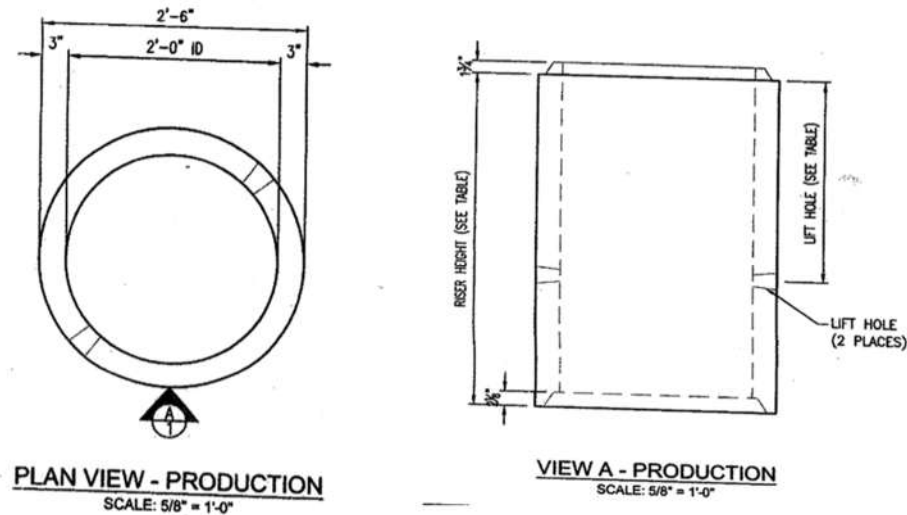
Cross-section of Concrete Pipes; b.) Elevation of Concrete Pipes (Courtesy of Oldcastle Precast)
